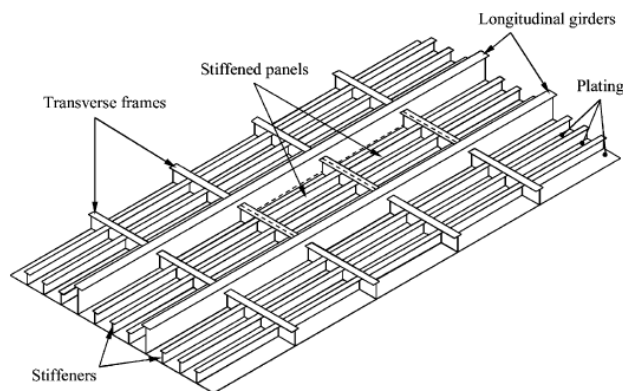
Stiffened plate structure (*Paik & Kim, 2002*)
